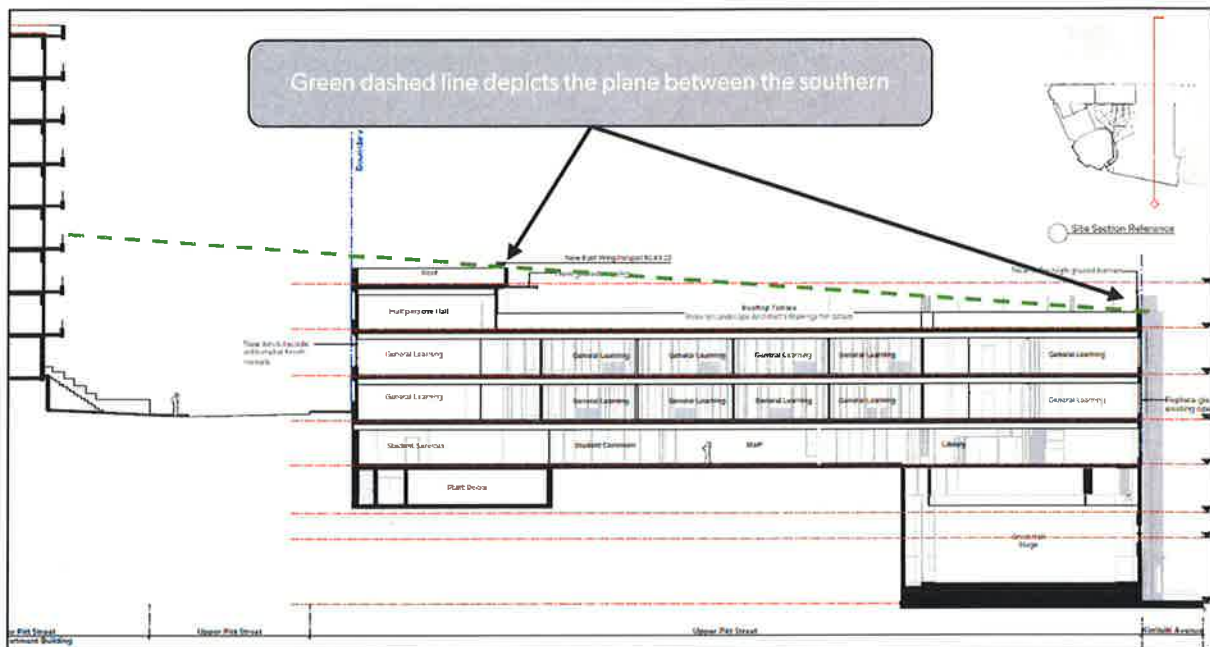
| Section showing the Main Campus building and 48 Upper Pitt Street (Source: Applicant's RtS 2018)
